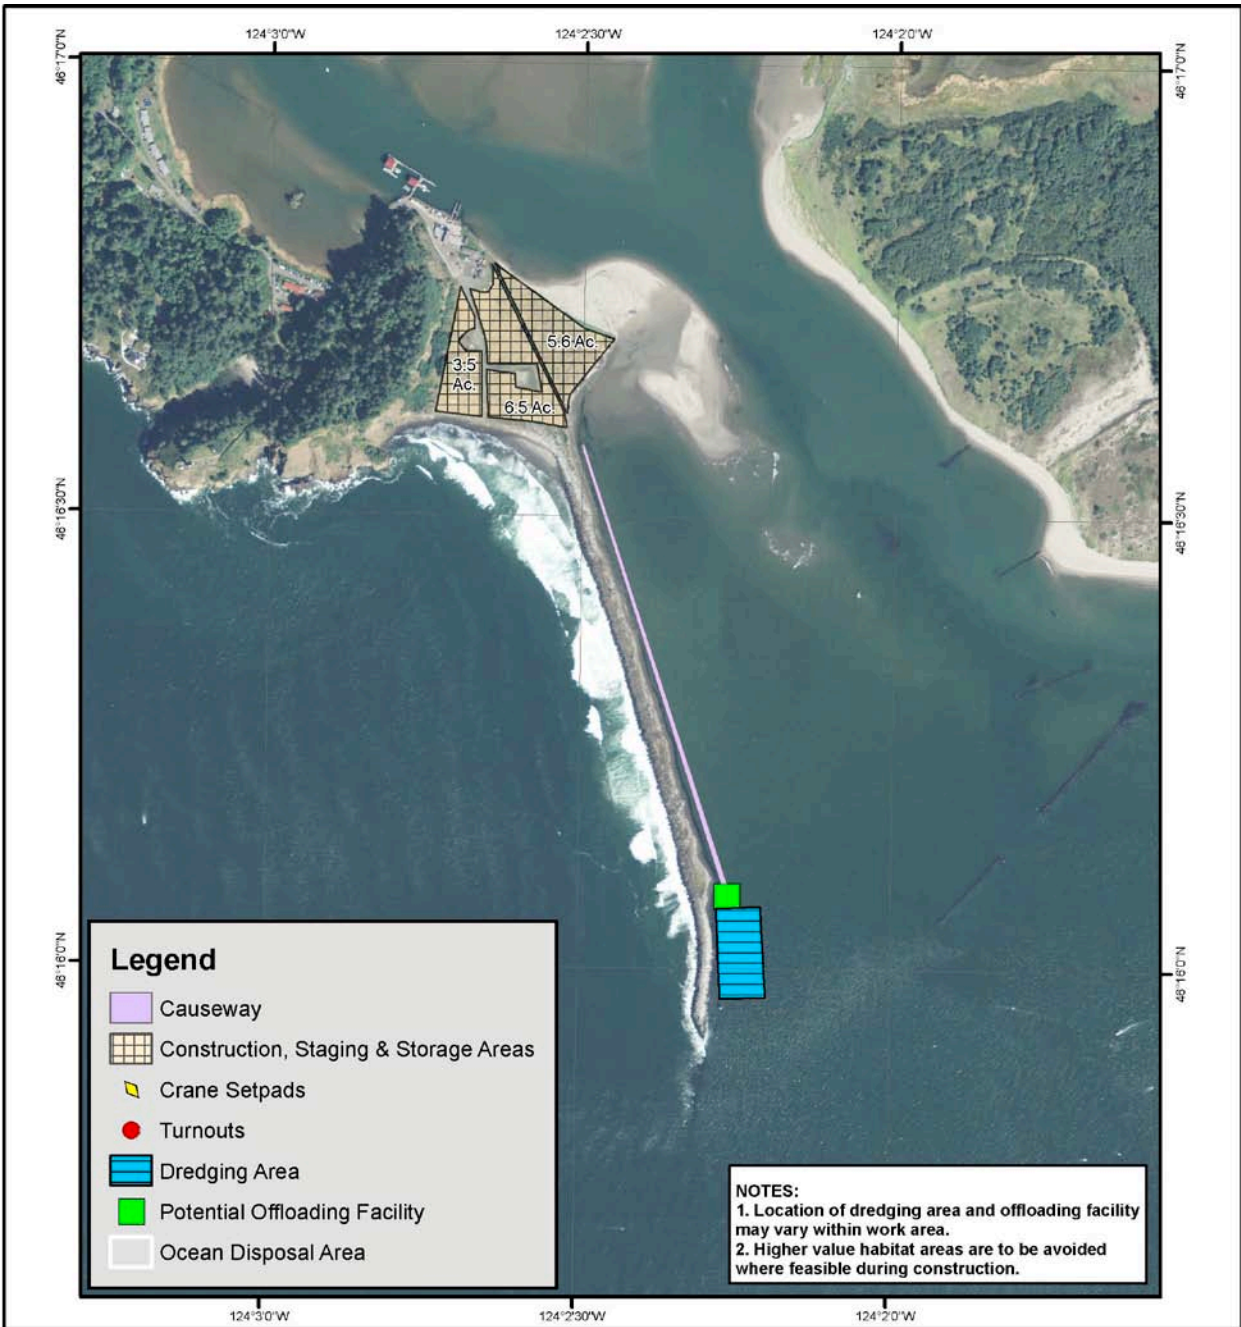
Jetty A Offloading, Staging, Storage and Causeway Facilities
